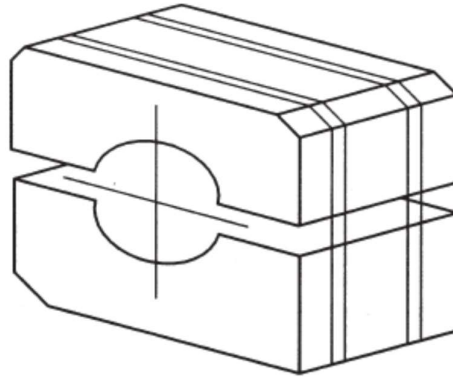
Typical Anti-buoyancy Weight – Concrete Block
